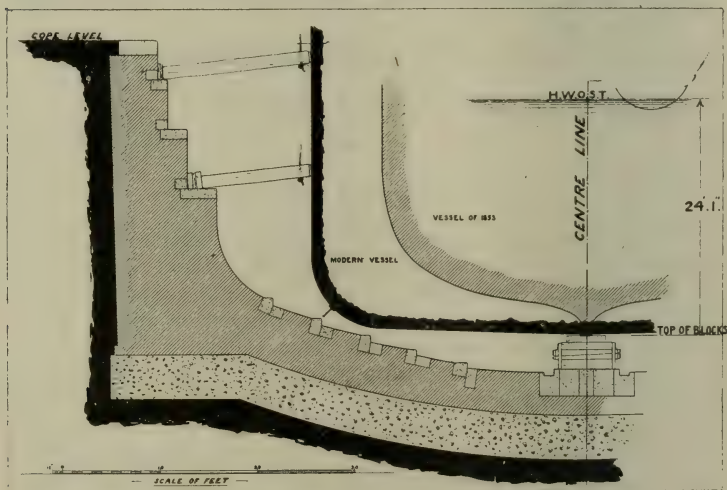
CROSS SECTION BEFORE REMODELLING.
